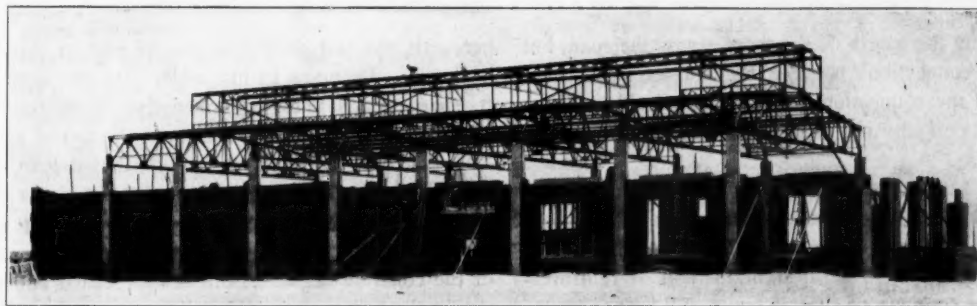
MILL BUILDING DURING CONSTRUCTION—EL PASO & SOUTHWESTERN RY.
